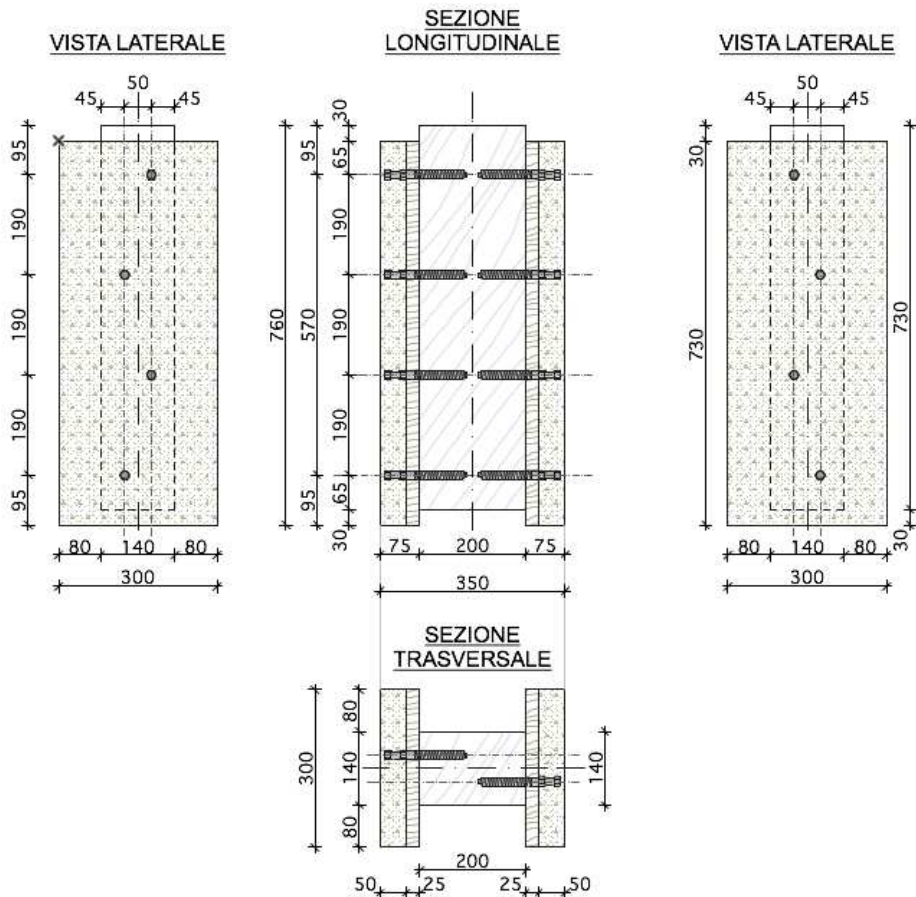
Geometry of the case specimens of wooden beam and steel connectors
